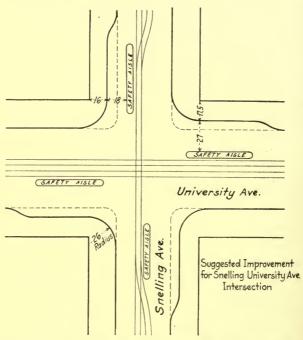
Intersection relief through splaying. Plan of St. Paul, p. 34, St. Paul, 1922.
